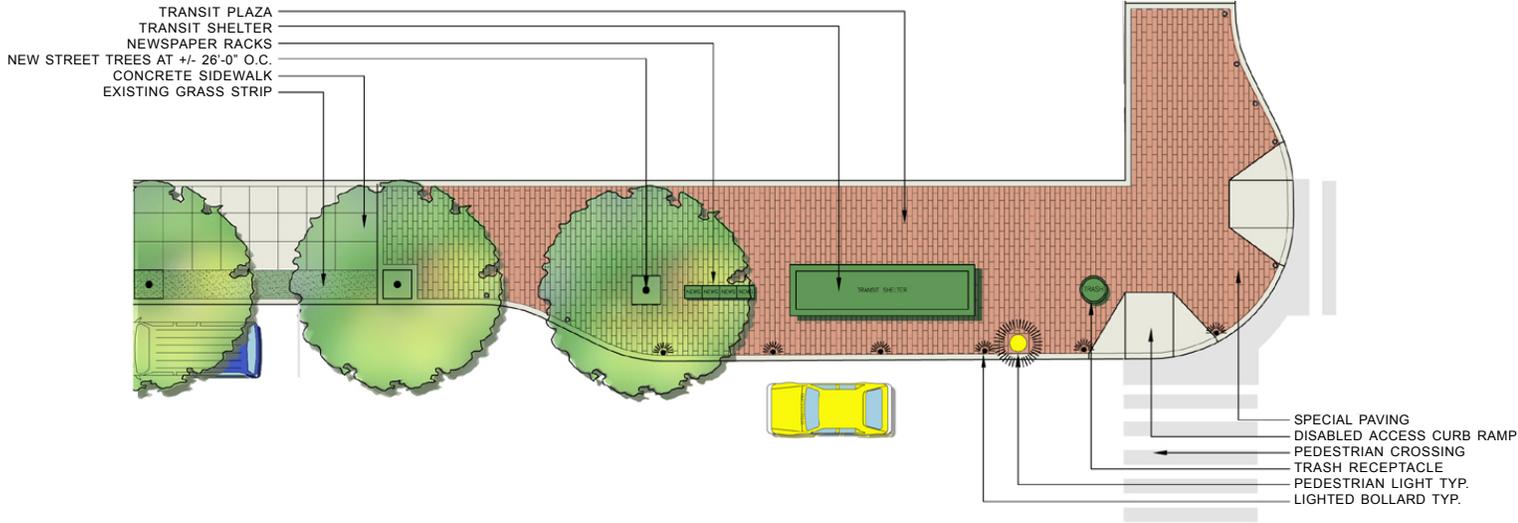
Pedestrian Corridor Improvements - Corner Sidewalk Extension
